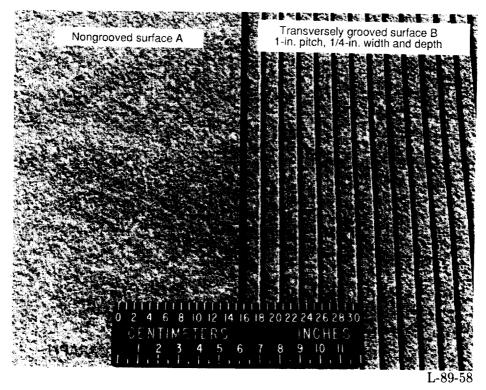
Close-up photographs of concrete test surfaces A (nongrooved) and B (transversely grooved, 1 in. \times 0.25 in. \times 0.25 in.) on runway 4/22 at Wallops Flight Facility.
